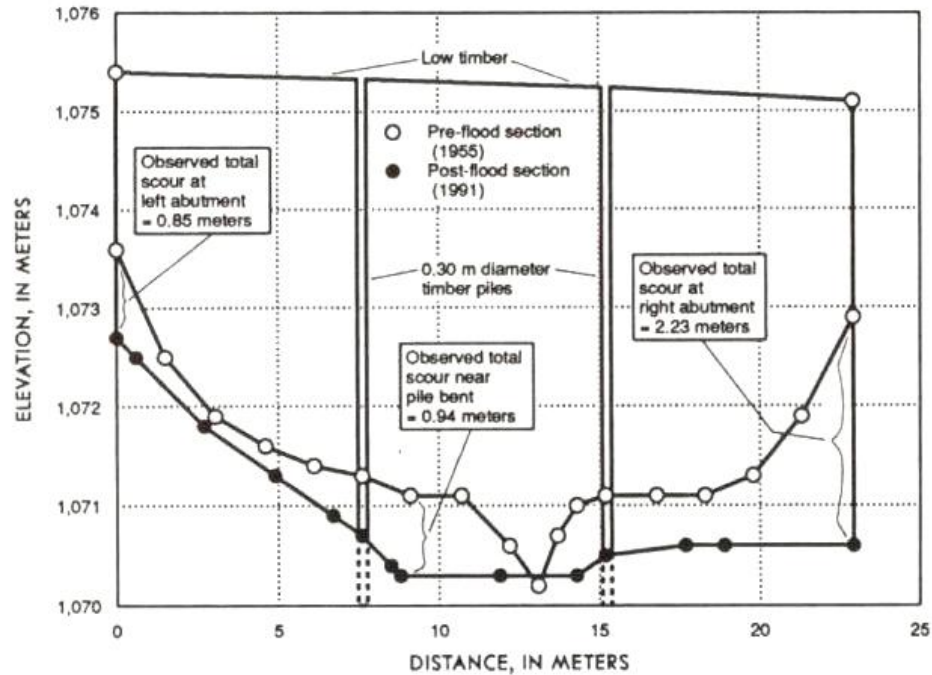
Looking downstream view of cross sections at upstream face of bridge. Razor Creek, Montana, 1991 (Holnbeck et al. 1993)
